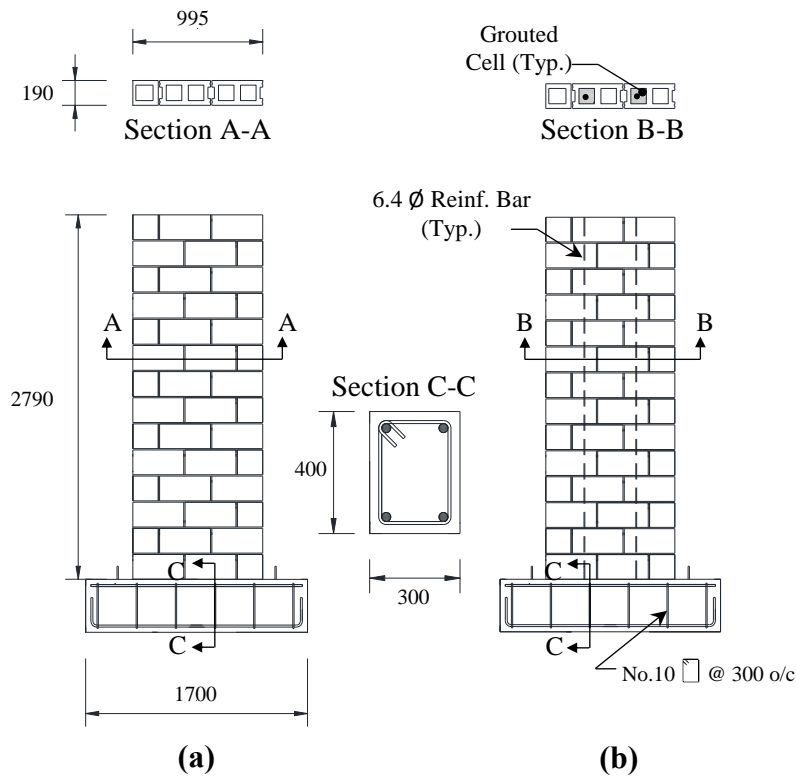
Control specimen geometry: (a) unreinforced and ungrouted walls, and (b) partially grouted and conventionally reinforced walls (dimensions in mm).
